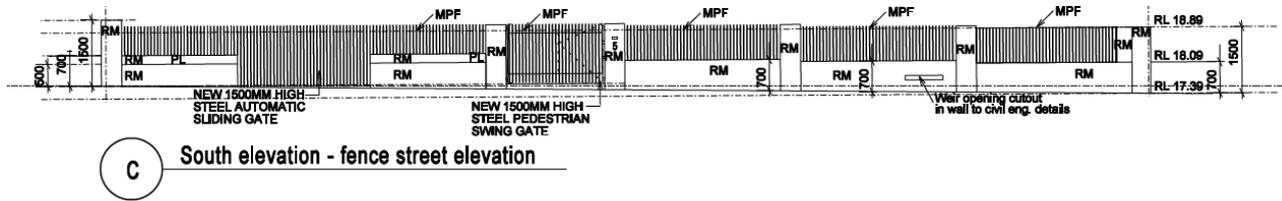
Southern (front) elevation of the proposed front boundary fencing.
